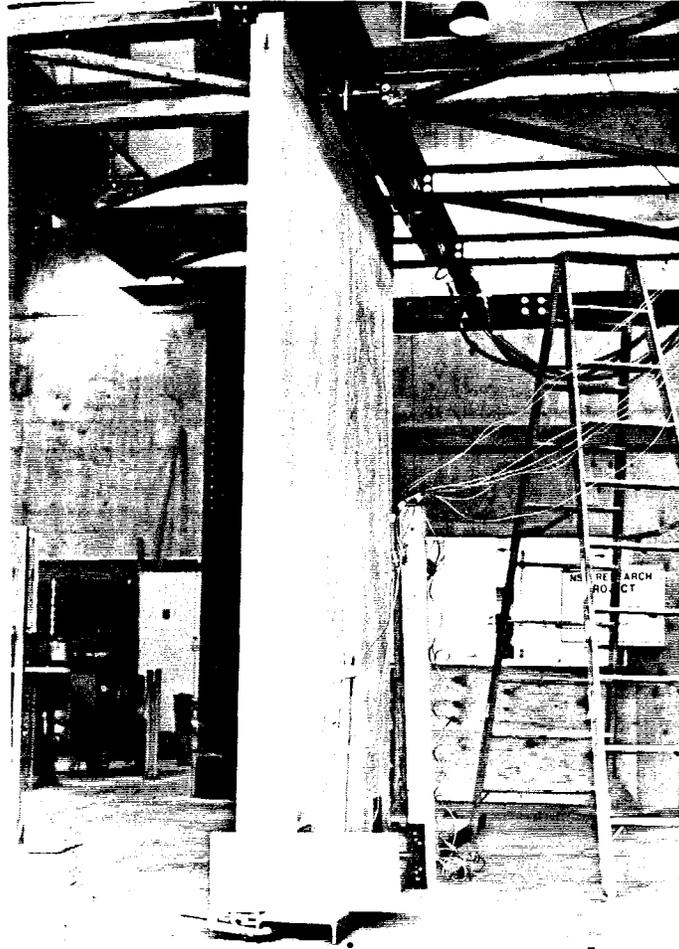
Overall View of Full-Size Precast Concrete Cladding Panel
